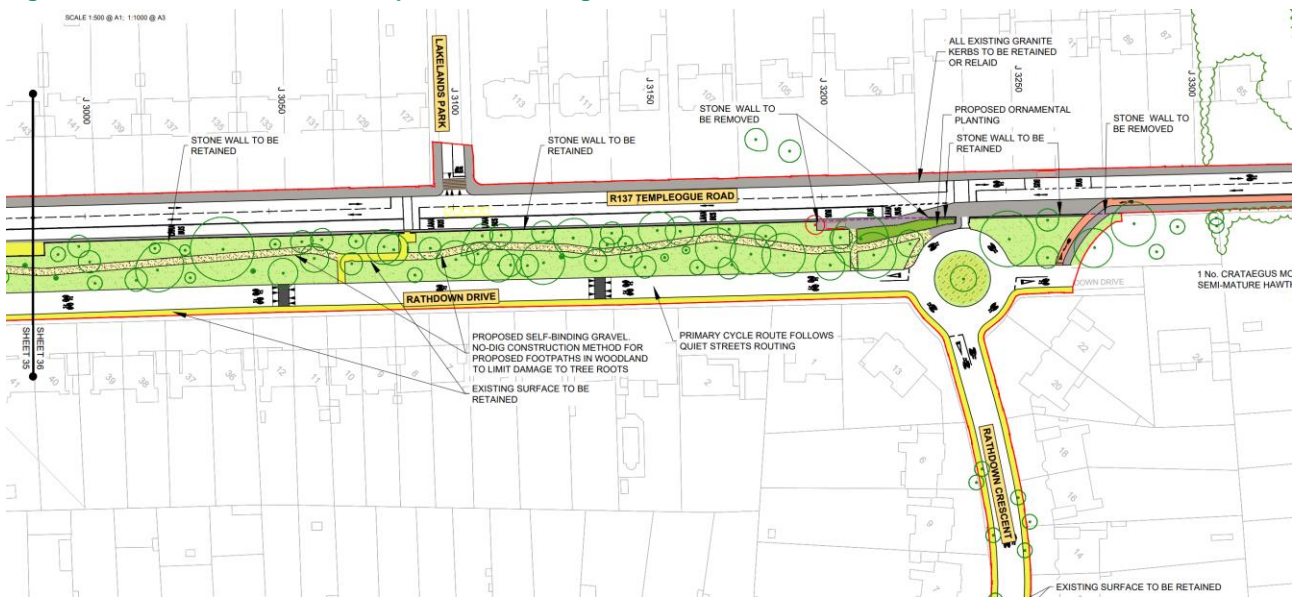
Extract from Landscape General Arrangement Plan Sheet 36 of 37
